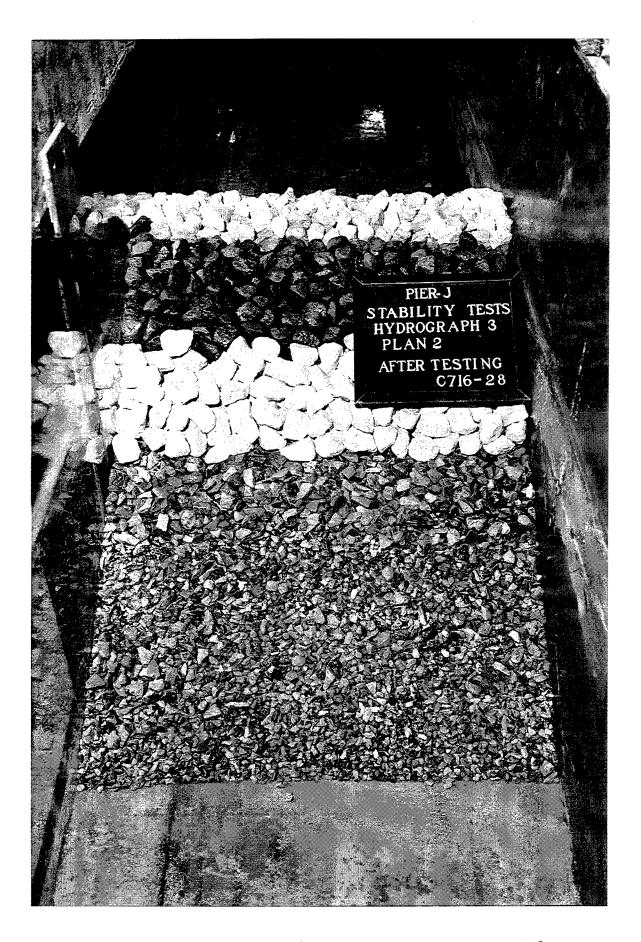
Harbor-side view of Plan 2 after testing step 4 of Hydrograph 3
